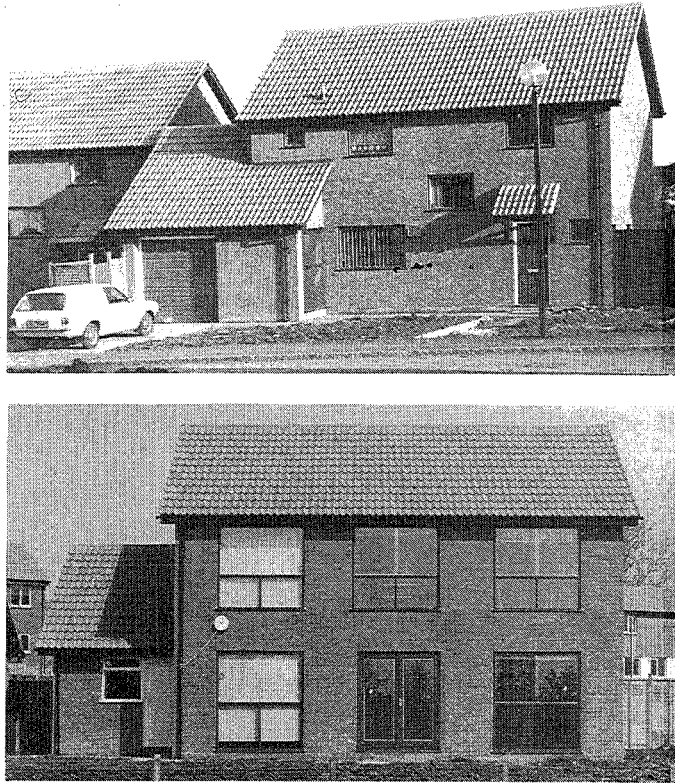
Great Linford houses : North (top) and South (above) elevations
